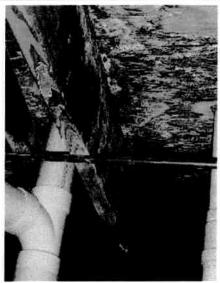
Plumbing - Leaks from the fixtures above these plumbing drains have led to severe deterioration of the floor deck and floor joists.
